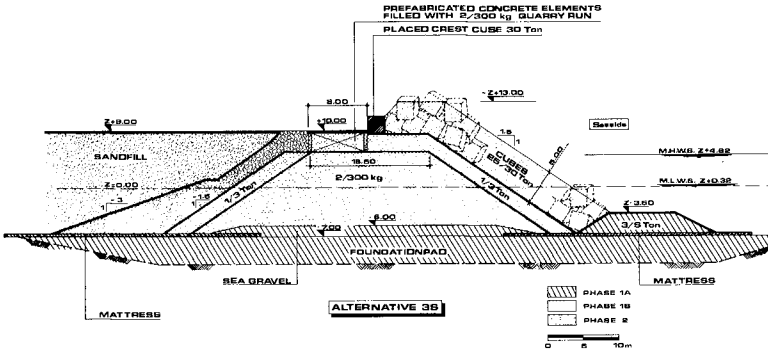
Development of design : rubble-mound breakwater alternative 3 b - core built by dumping over the head
